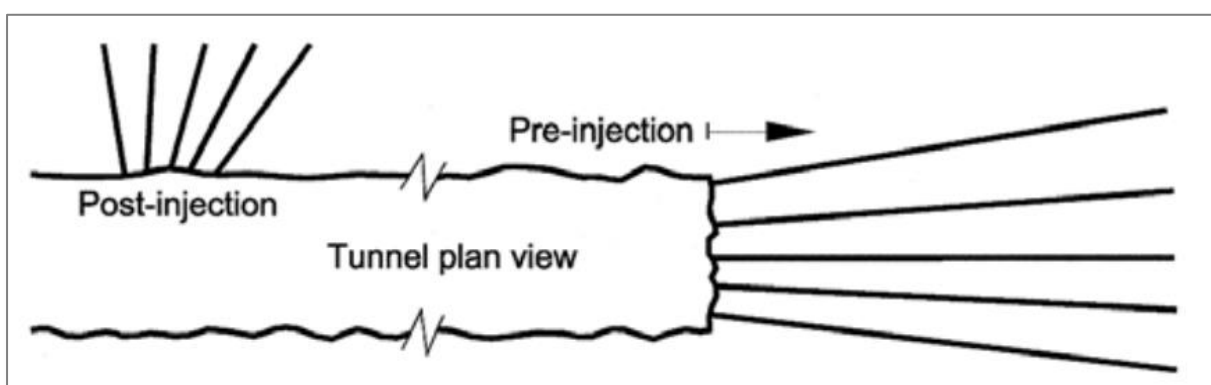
| PRE-EXCAVATION GROUTING AND POST-GROUTING
